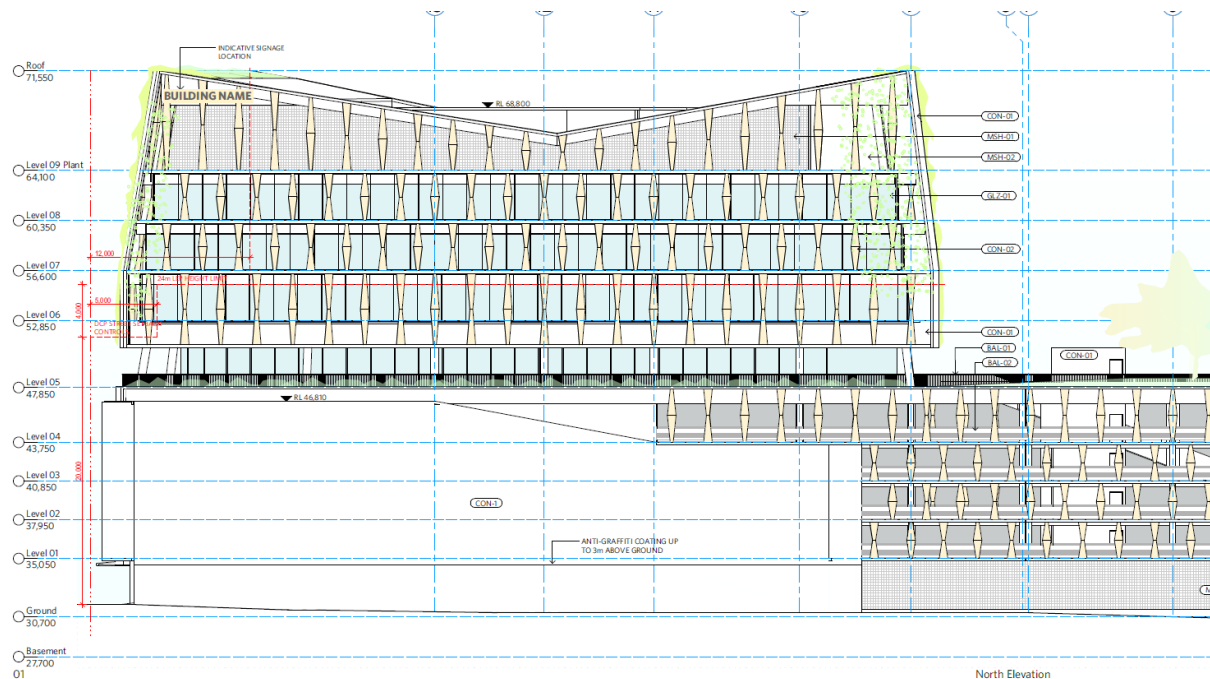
Extract of northern elevation showing indicative signage (Source: DBJ)
